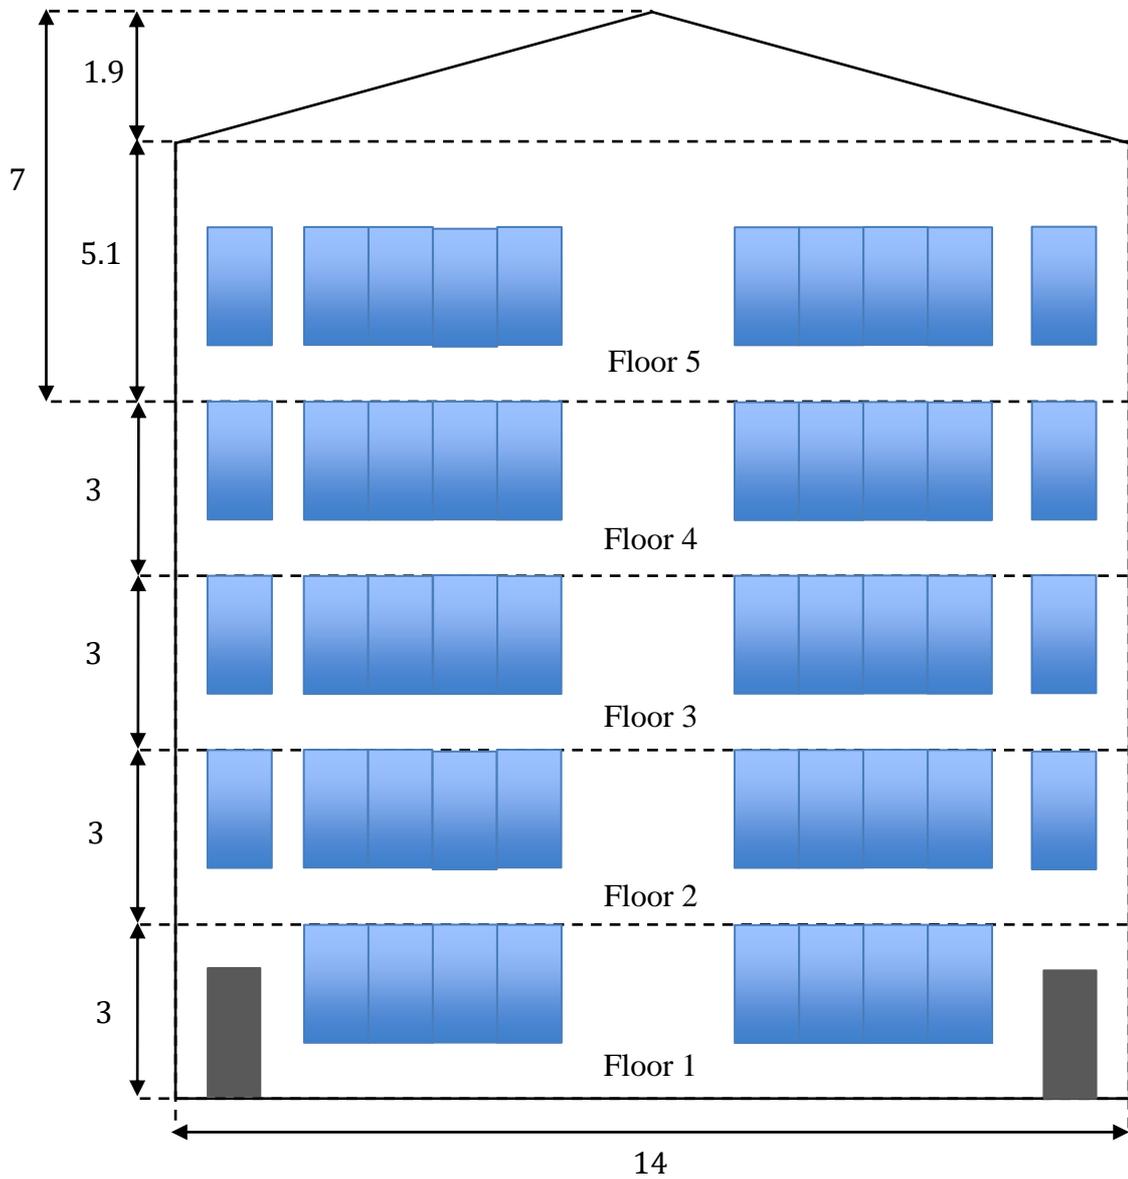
Placement of windows and doors on the exterior wall of the atrium, where the measurements are expressed in meters.
